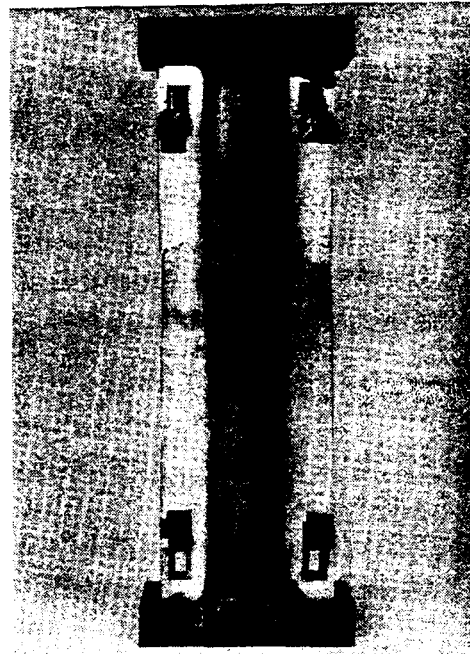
Skin Flange of Failed Specimen. Failure of flanges occurred prior to crimping of channel section (133426B)
